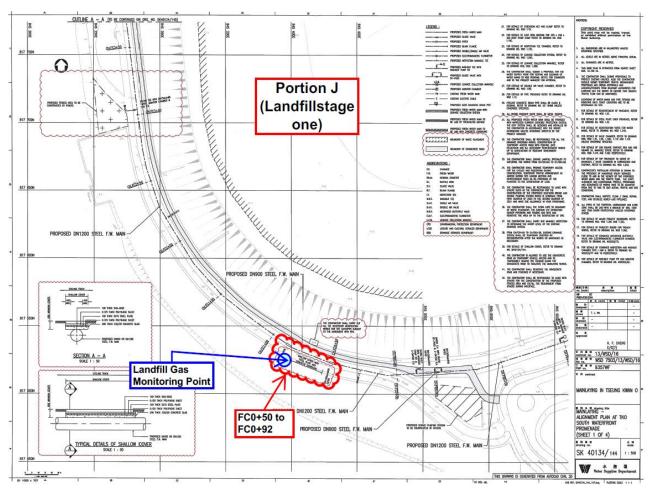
Location Plan for Portion J – Landfill Stage 1 (FC0+50-FC0+92)
